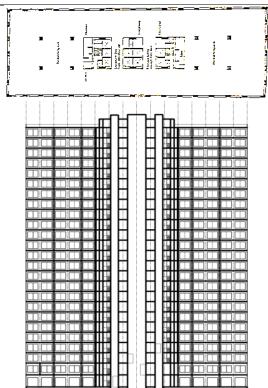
Typical floor plan [19] and section of the Nile tower.
